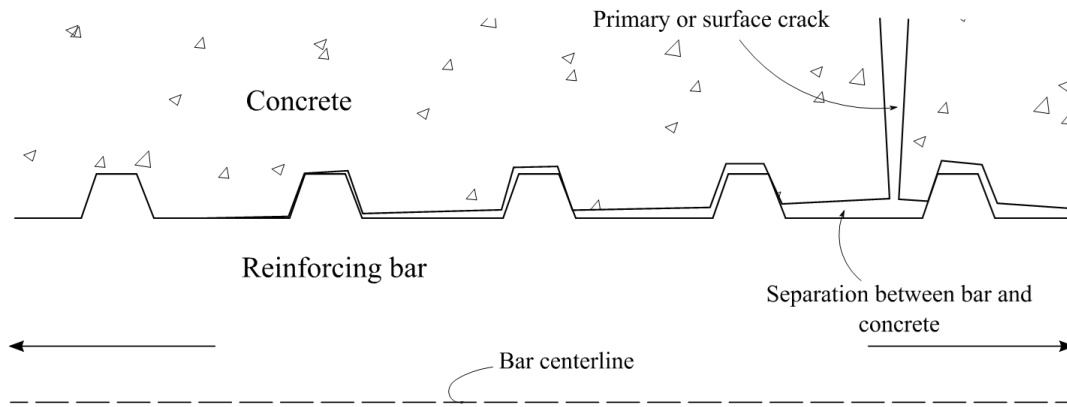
Section through reinforcing bar and concrete showing separation that occurs near a primary crack (Lutz and Gergely 1967)
